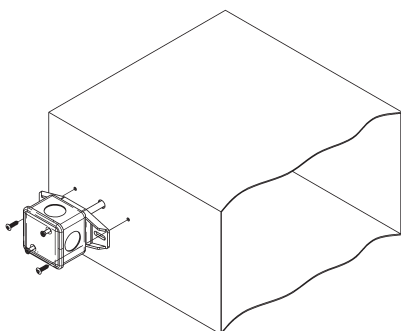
BAPI-Box (BB) Enclosure Mounting and installation Holes (Rotate 90° for Horizontal Mounting)
